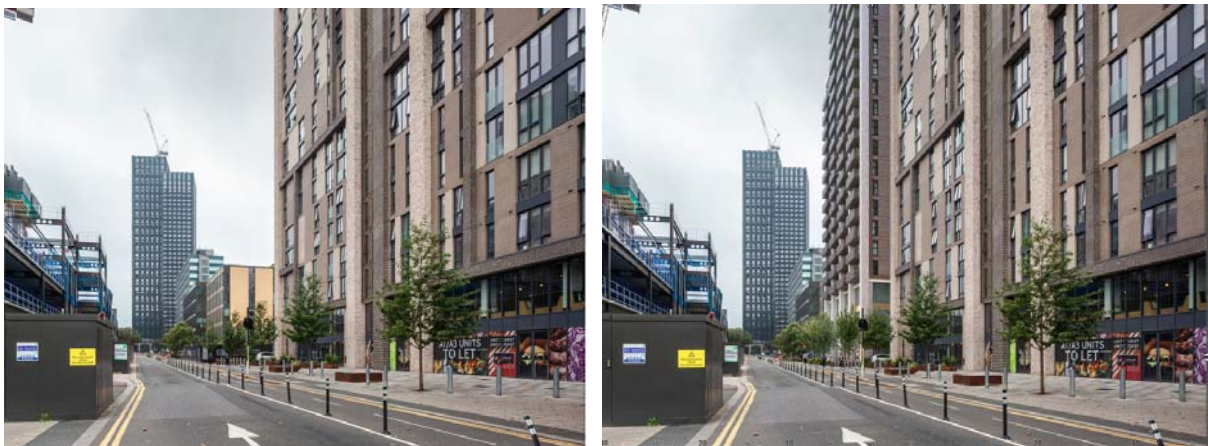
Existing and proposed visualisation at junction of Dingwall Road and Lansdowne Road
